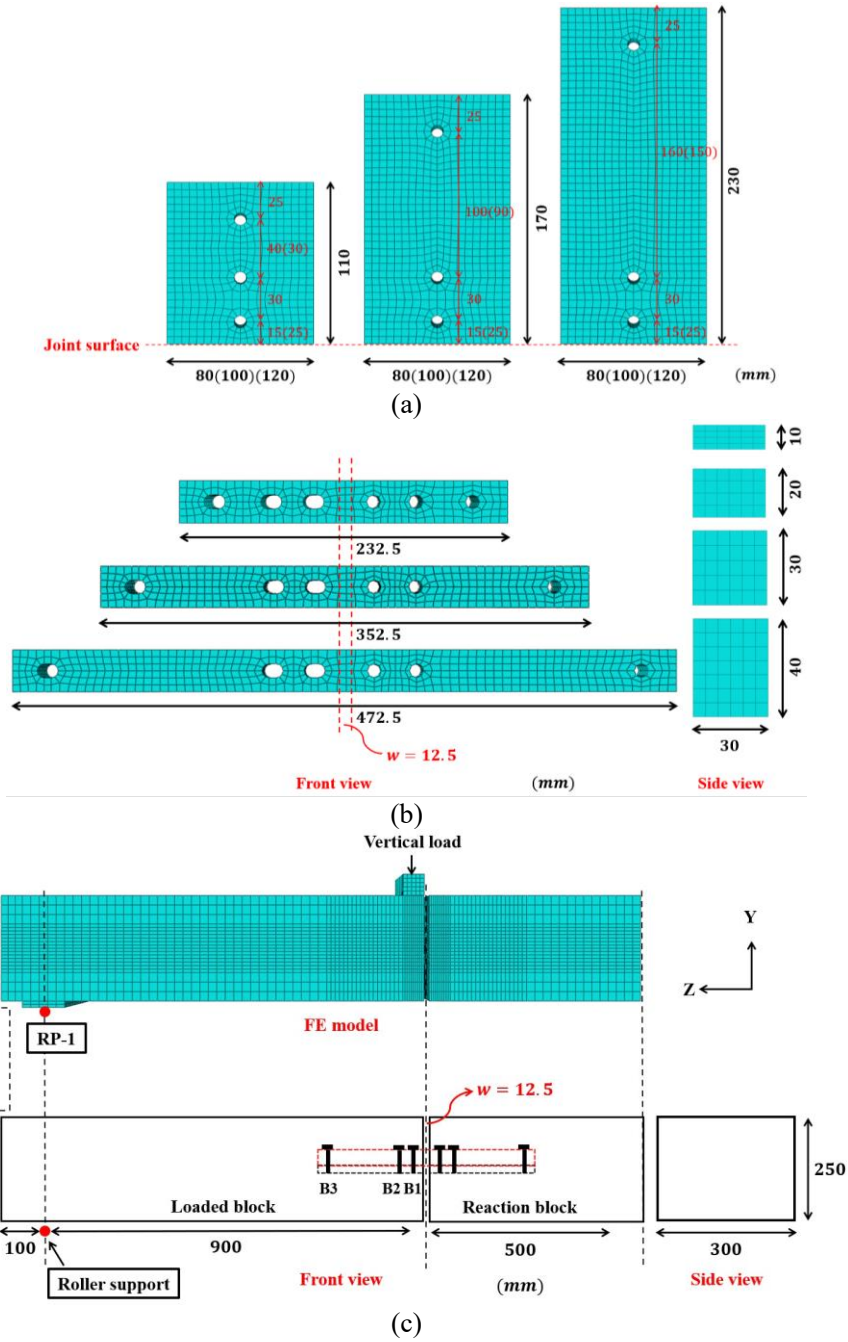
Dimensions of components and the full-scale model (a) steel plate, (b) steel bar connection, (c) full-scale model.
